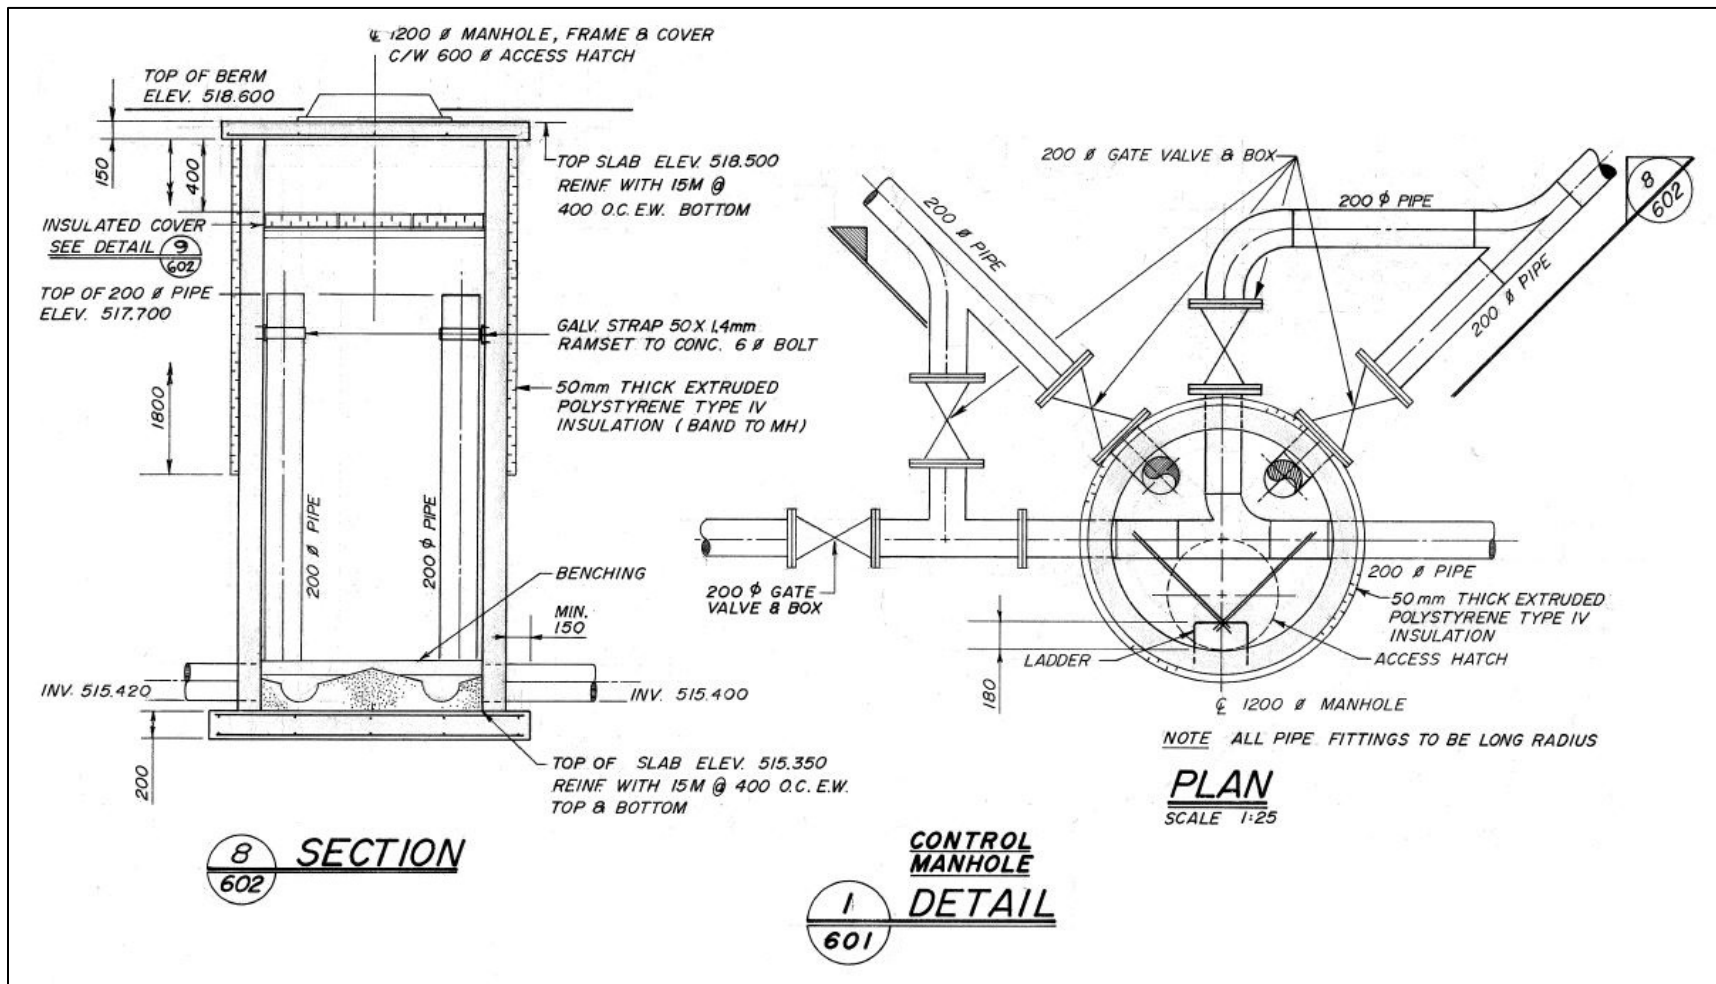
1988 Construction drawing - Control manhole details (Modified from Bullée Consulting Ltd. 1988c)
